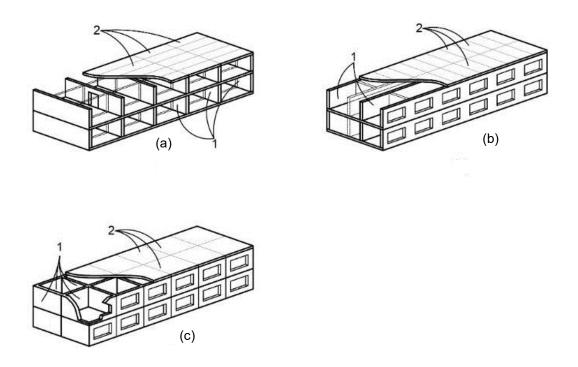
Basic structural configurations for LPBs: (a) a cross-wall system, (b) a long-wall system, and (c) a two-way system (note: 1, wall panel; 2, floor panel) (source: based on fib, 2008).⁴⁹
